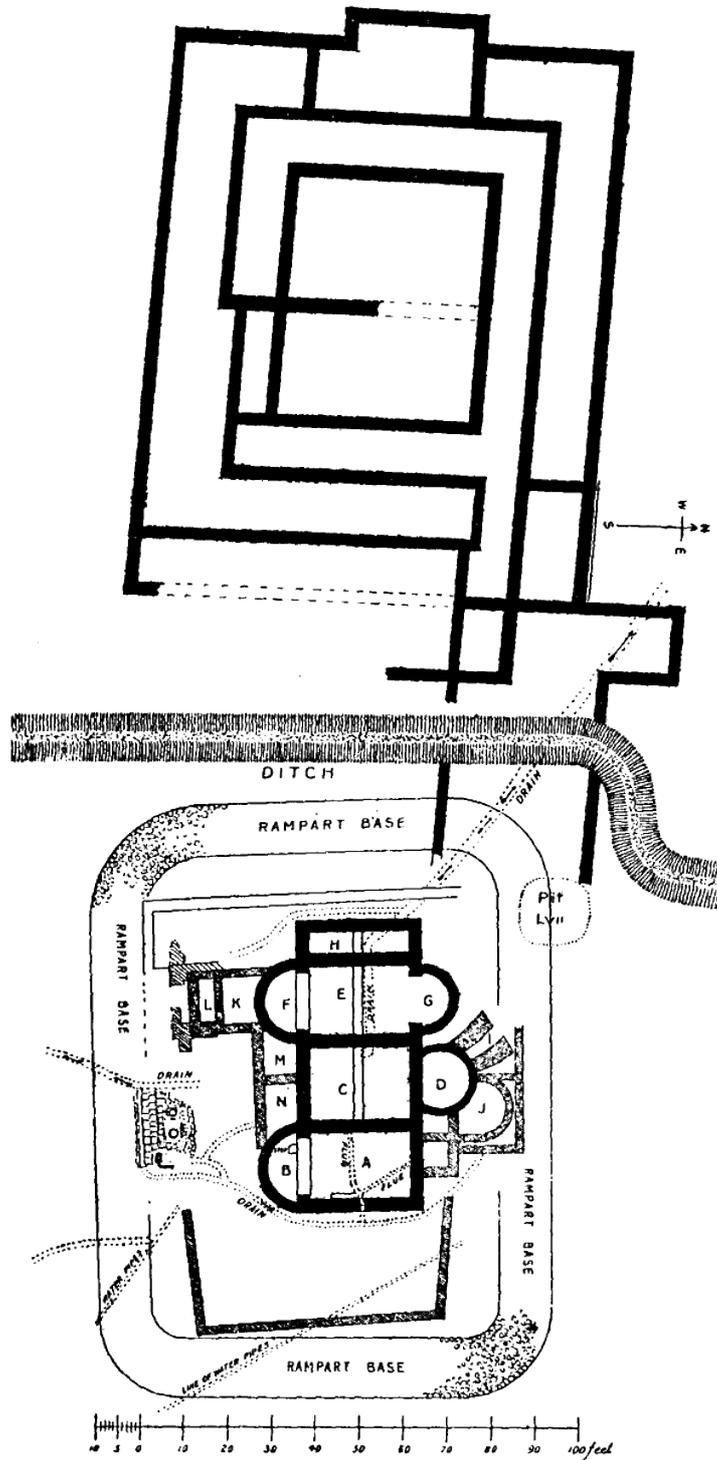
PLAN OF BATH AND ADJOINING BUILDINGS AT NEWSTEAD
